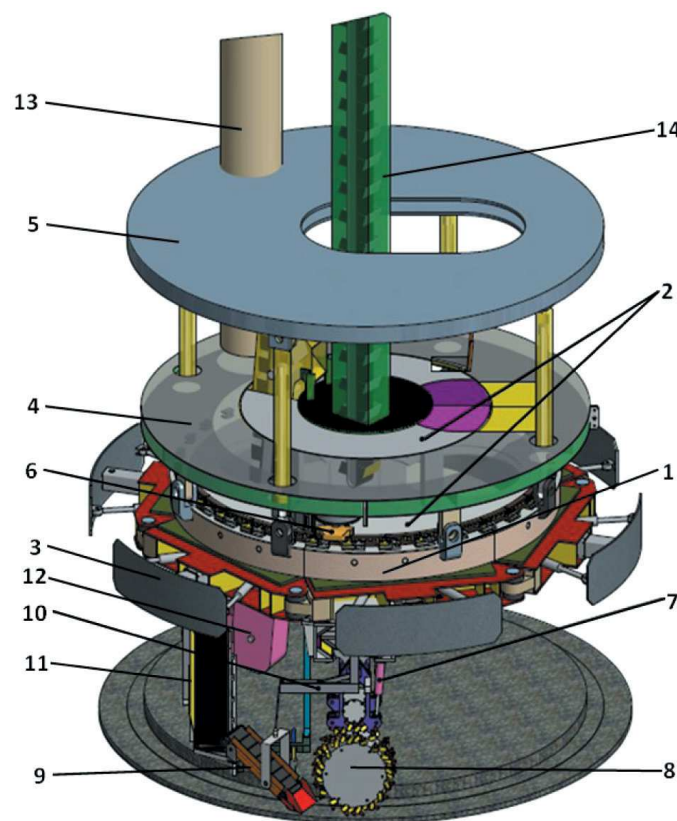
Model of developed shaft complex [10]: 1 – working platform, 2 – rotary ring, 3 – expanding system, 4 – fixed working platform, 5 – permanent working platform, 6 – drive of working platform rotation, 7 – actuators for arm lifting, 8 – milling mining head, 9 – short belt conveyor, 10 – actuators for short belt conveyor lifting, 11 – linear belt conveyor, 12 – overflow and short bucket conveyor, 13 – ventilation pipe-line, 14 – long bucket conveyor
